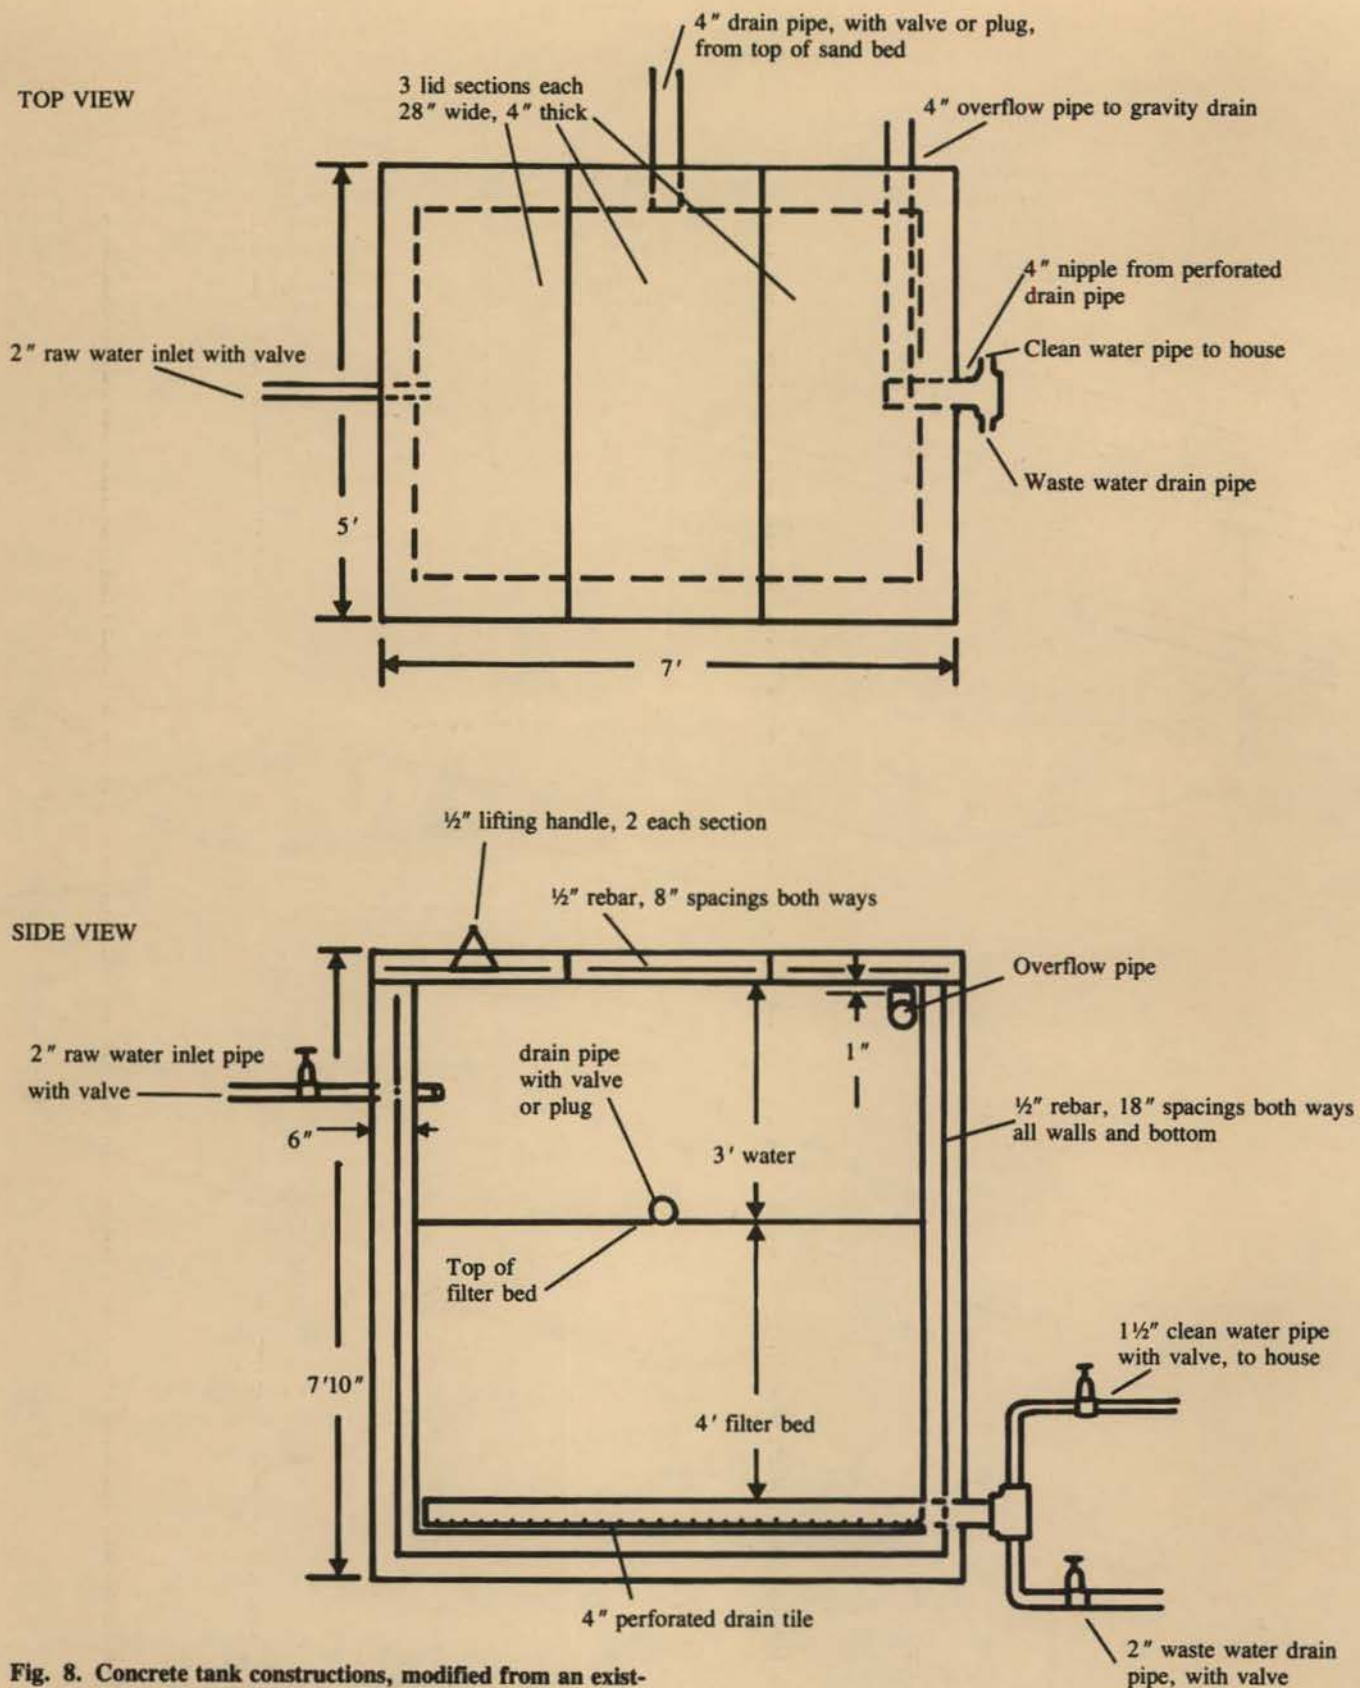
Concrete tank constructions, modified from an existing facility in Boundary County, Idaho.
